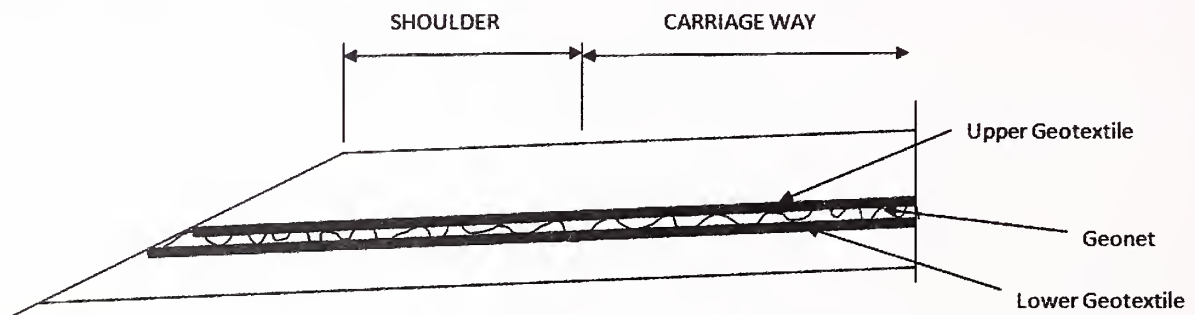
A Pavement Section Showing Day Lighted Drainage Layer (Drainage Composite)
